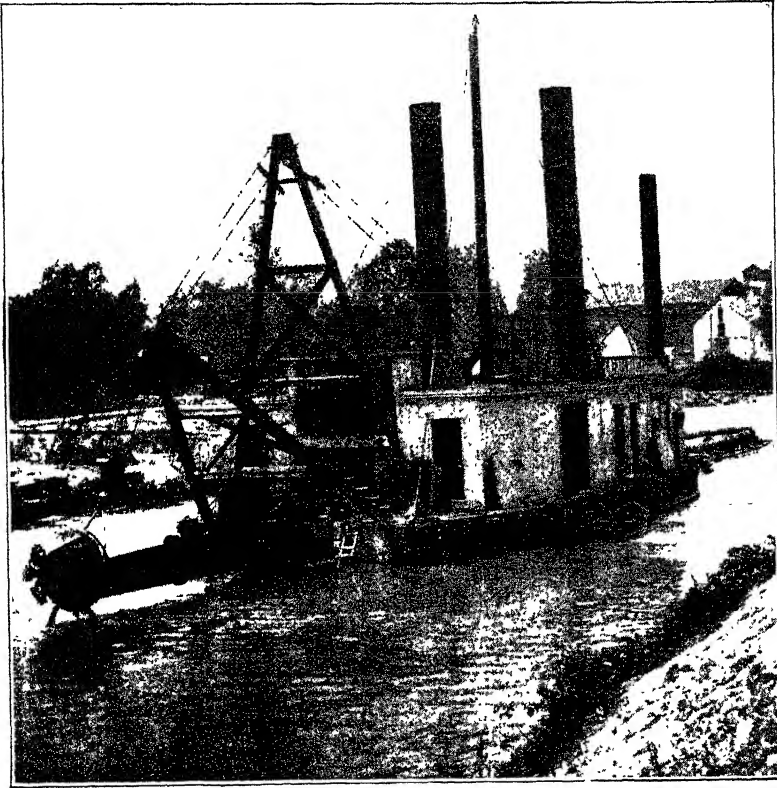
Typical Hydraulic Dredge on Canal Construction
